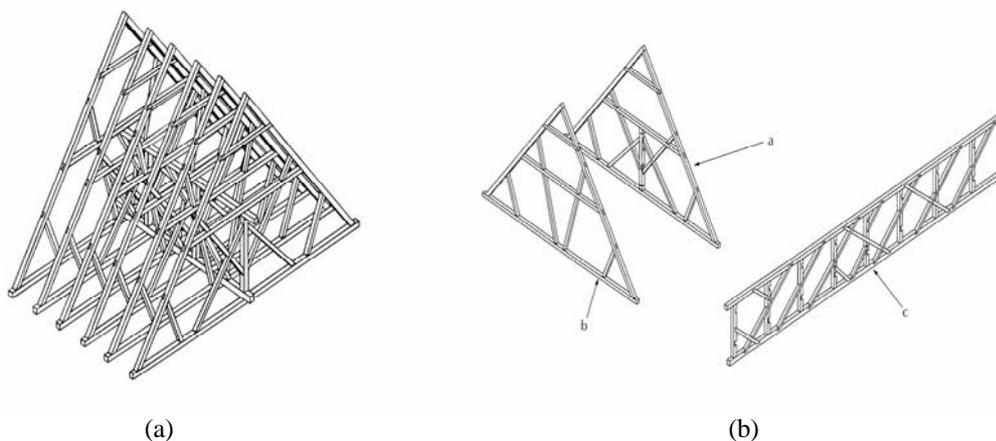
Frames in Gothic roof structures on common rafters and tie-beams with collar beams, (a) unit, (b) frames
